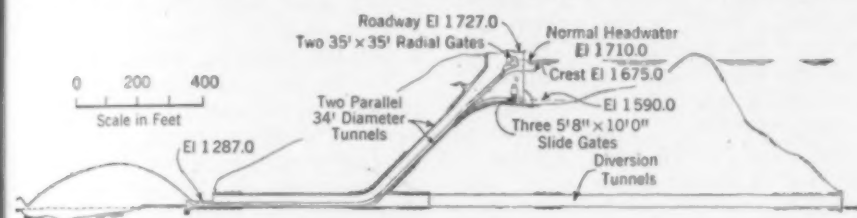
SECTION THROUGH FONTANA SPILLWAY TUNNELS
